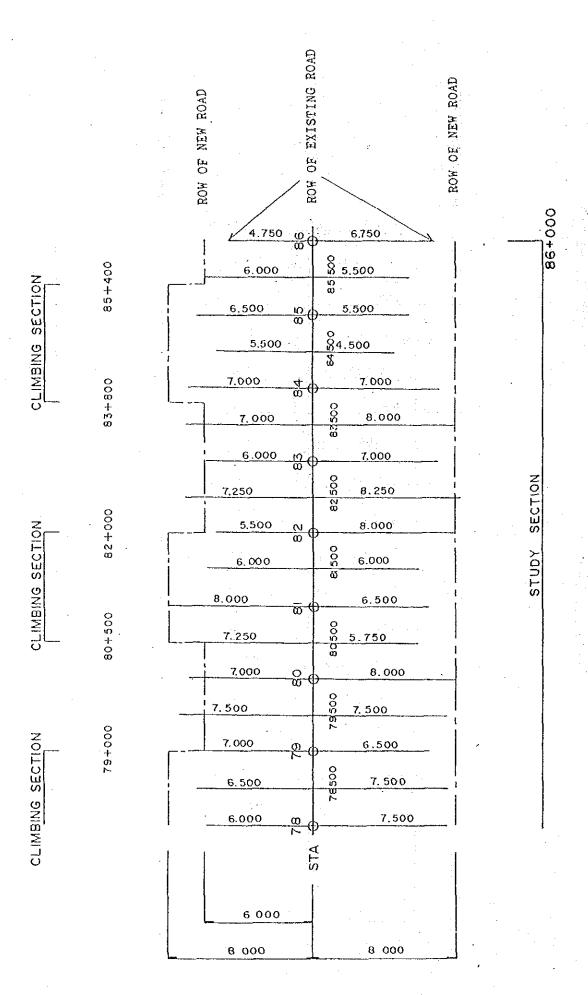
B Standard Section and Climbing Section (B)
